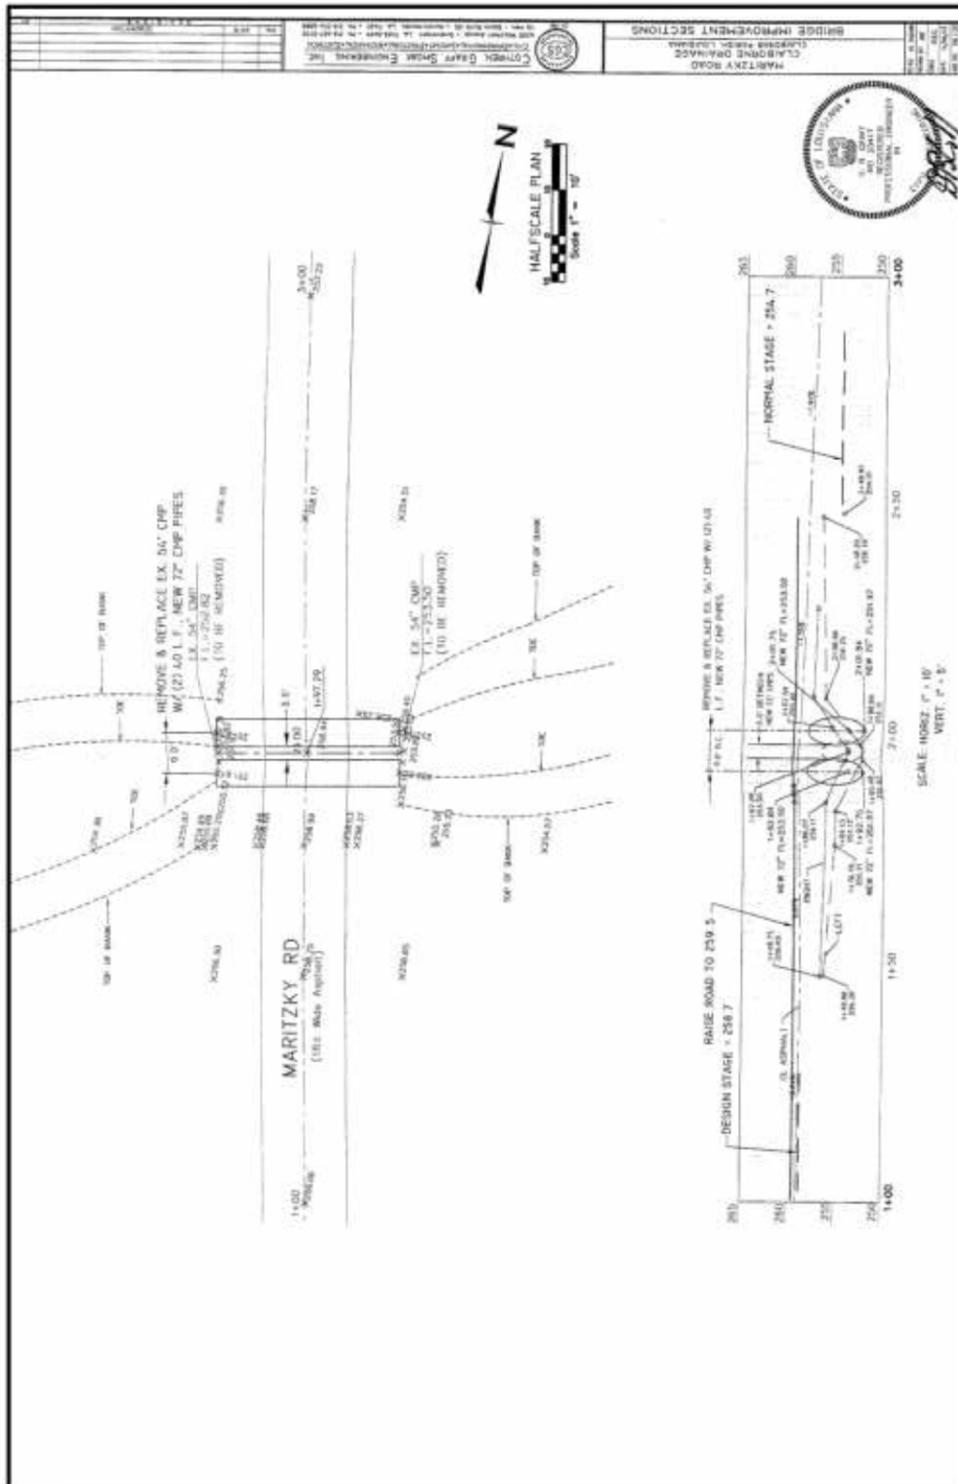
Construction plans for the proposed Maritzky Road in PA 8 (Cothren, Graff, Smoak Engineering, Inc. 11/6/12).
